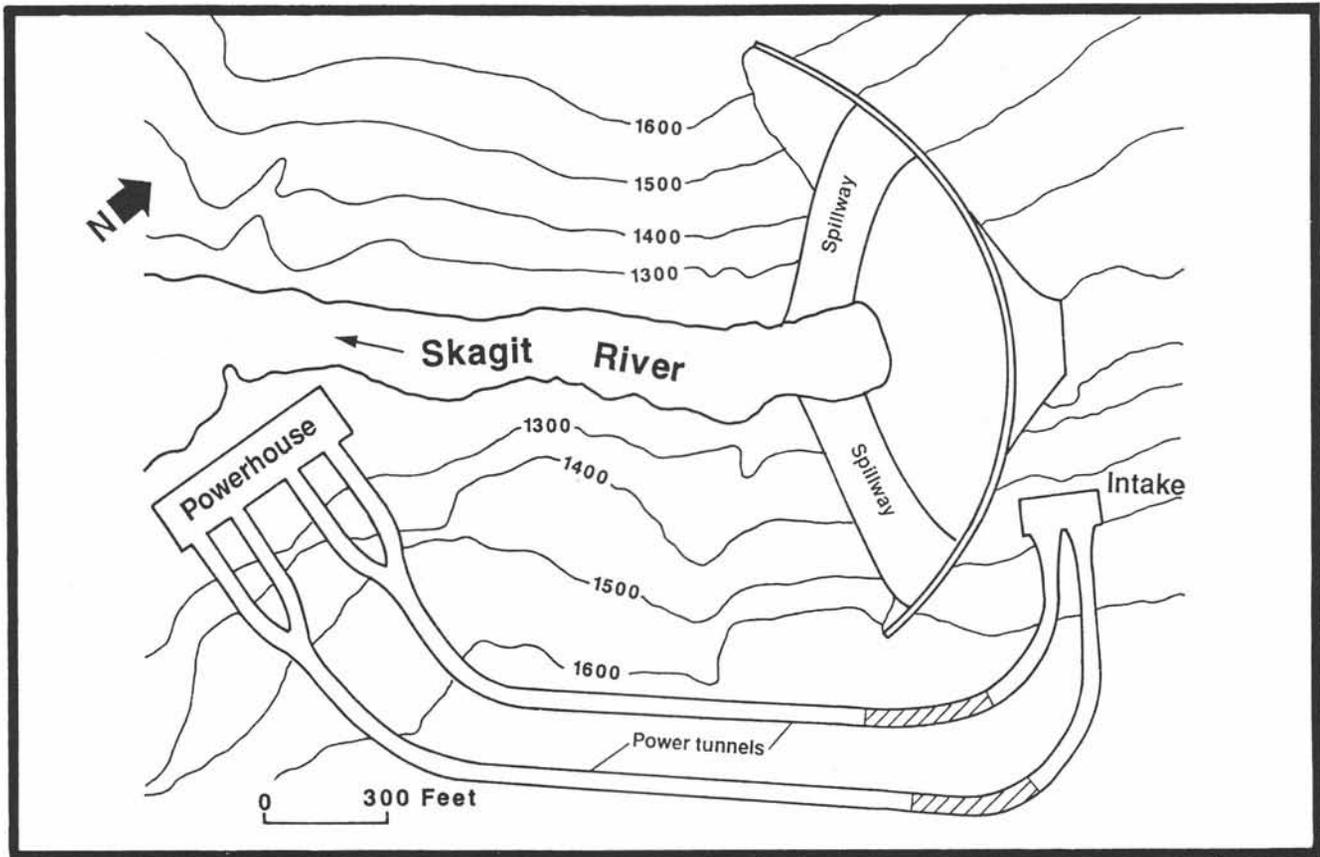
Plan of Ross Dam. Hachured areas of tunnels were excavated before pouring concrete in the second stage.
